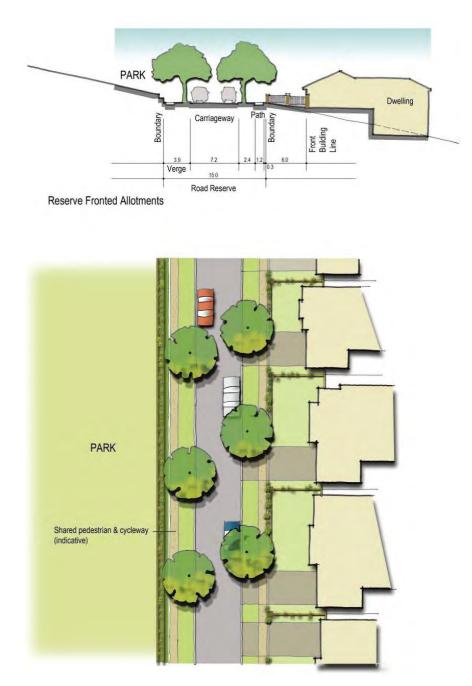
Indicative cross-sections and plans of desired streetscapes for allotments with precinct
